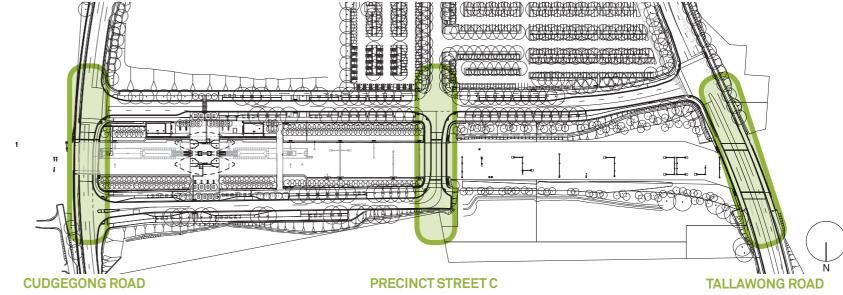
CUD\_Cudgegong Road Rail Over Bridge Locations. Source: HASSELL.
